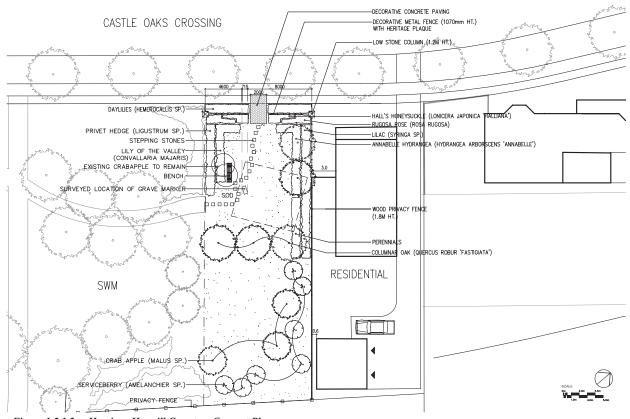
Harrison Hewgill Cemetery Concept Plan
